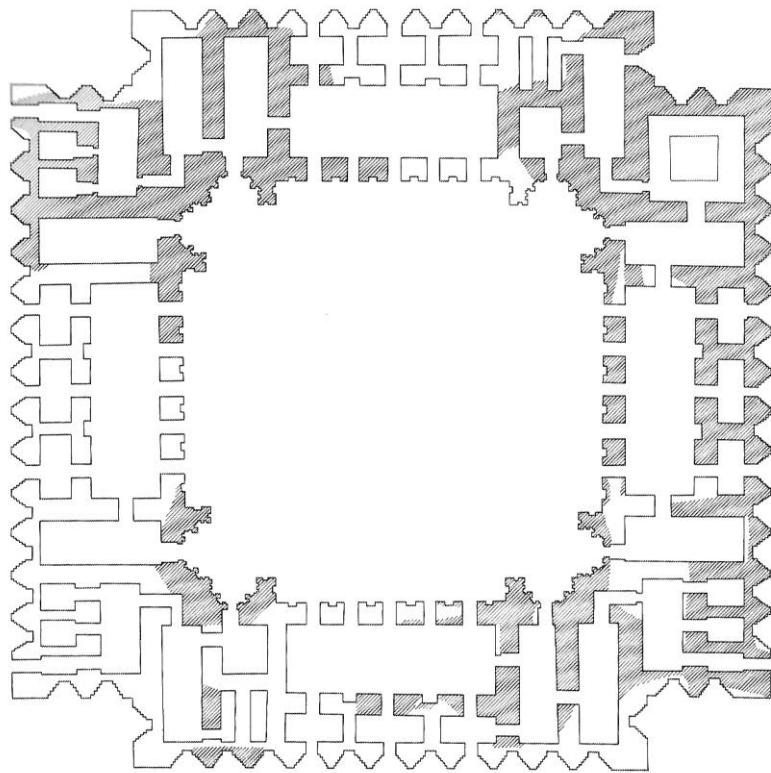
The Bau Mit Den Vier Sälen/Empfangspalast (Square Room Building) at Uruk
